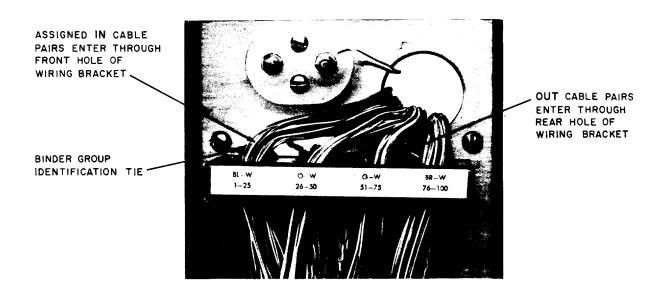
Assigned IN Cable Pair Routed Through Front Holes of Wiring Bracket
